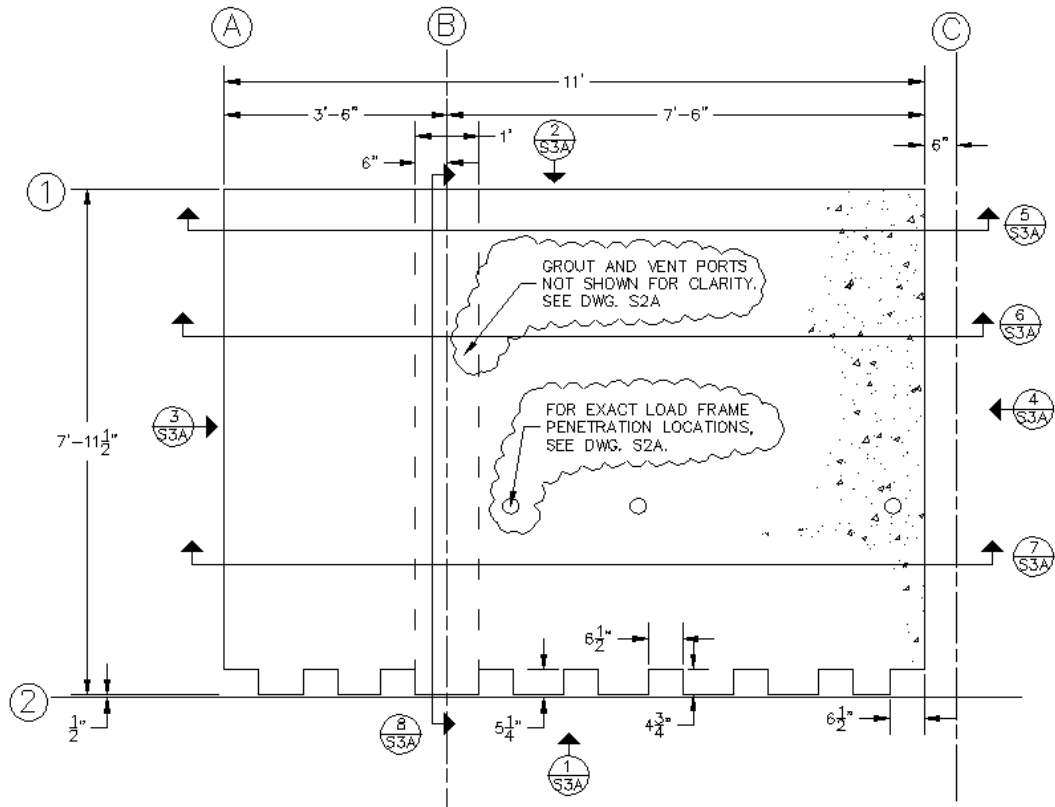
Typical Full-Depth Panel Geometry Plan
